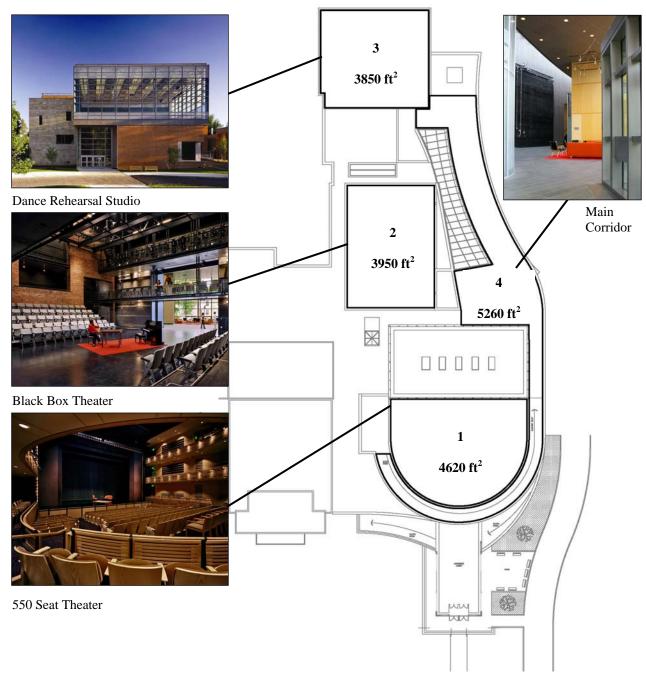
Roof Plan Showing Potential Locations for Green Roof Application
